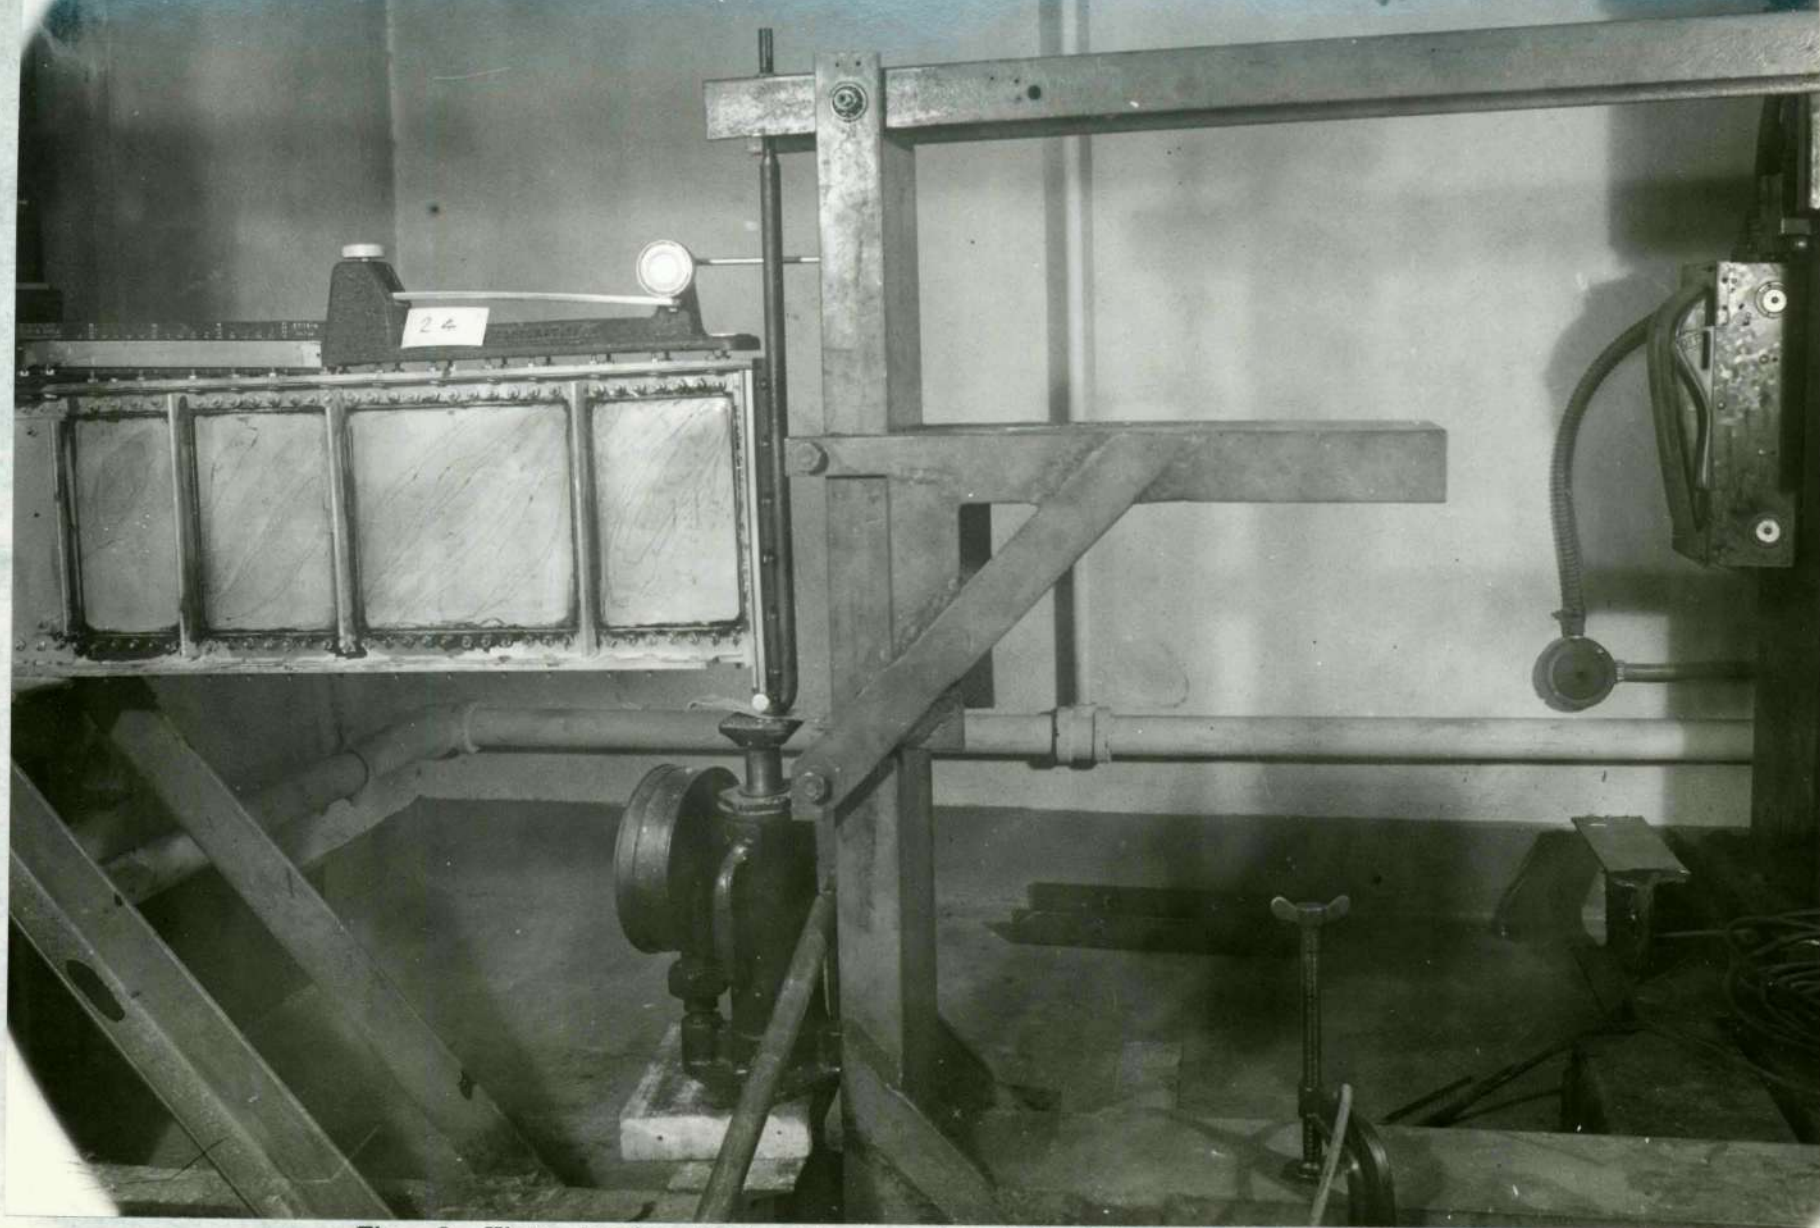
View showing test set-up employed in test five, with beam of tests four and five mounted in jig.
